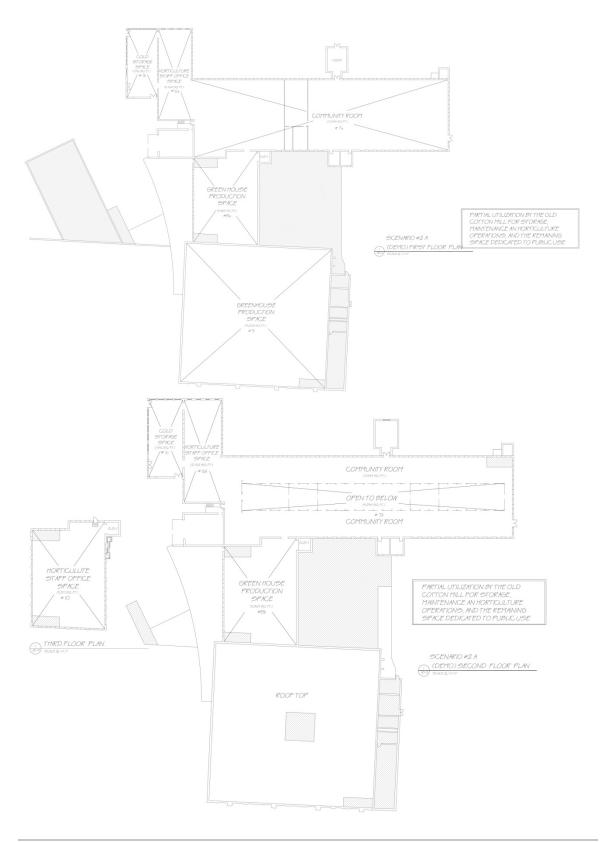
Retail and Storage operation - Option 2A Main and Second Floor Plan
